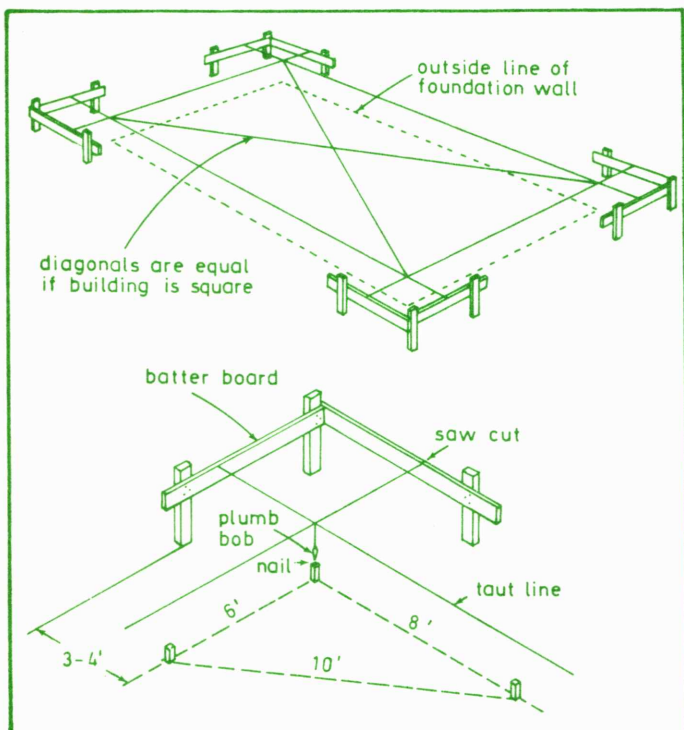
Staking and laying out the foundation. A square and level foundation makes the job of installing the greenhouse easier.
